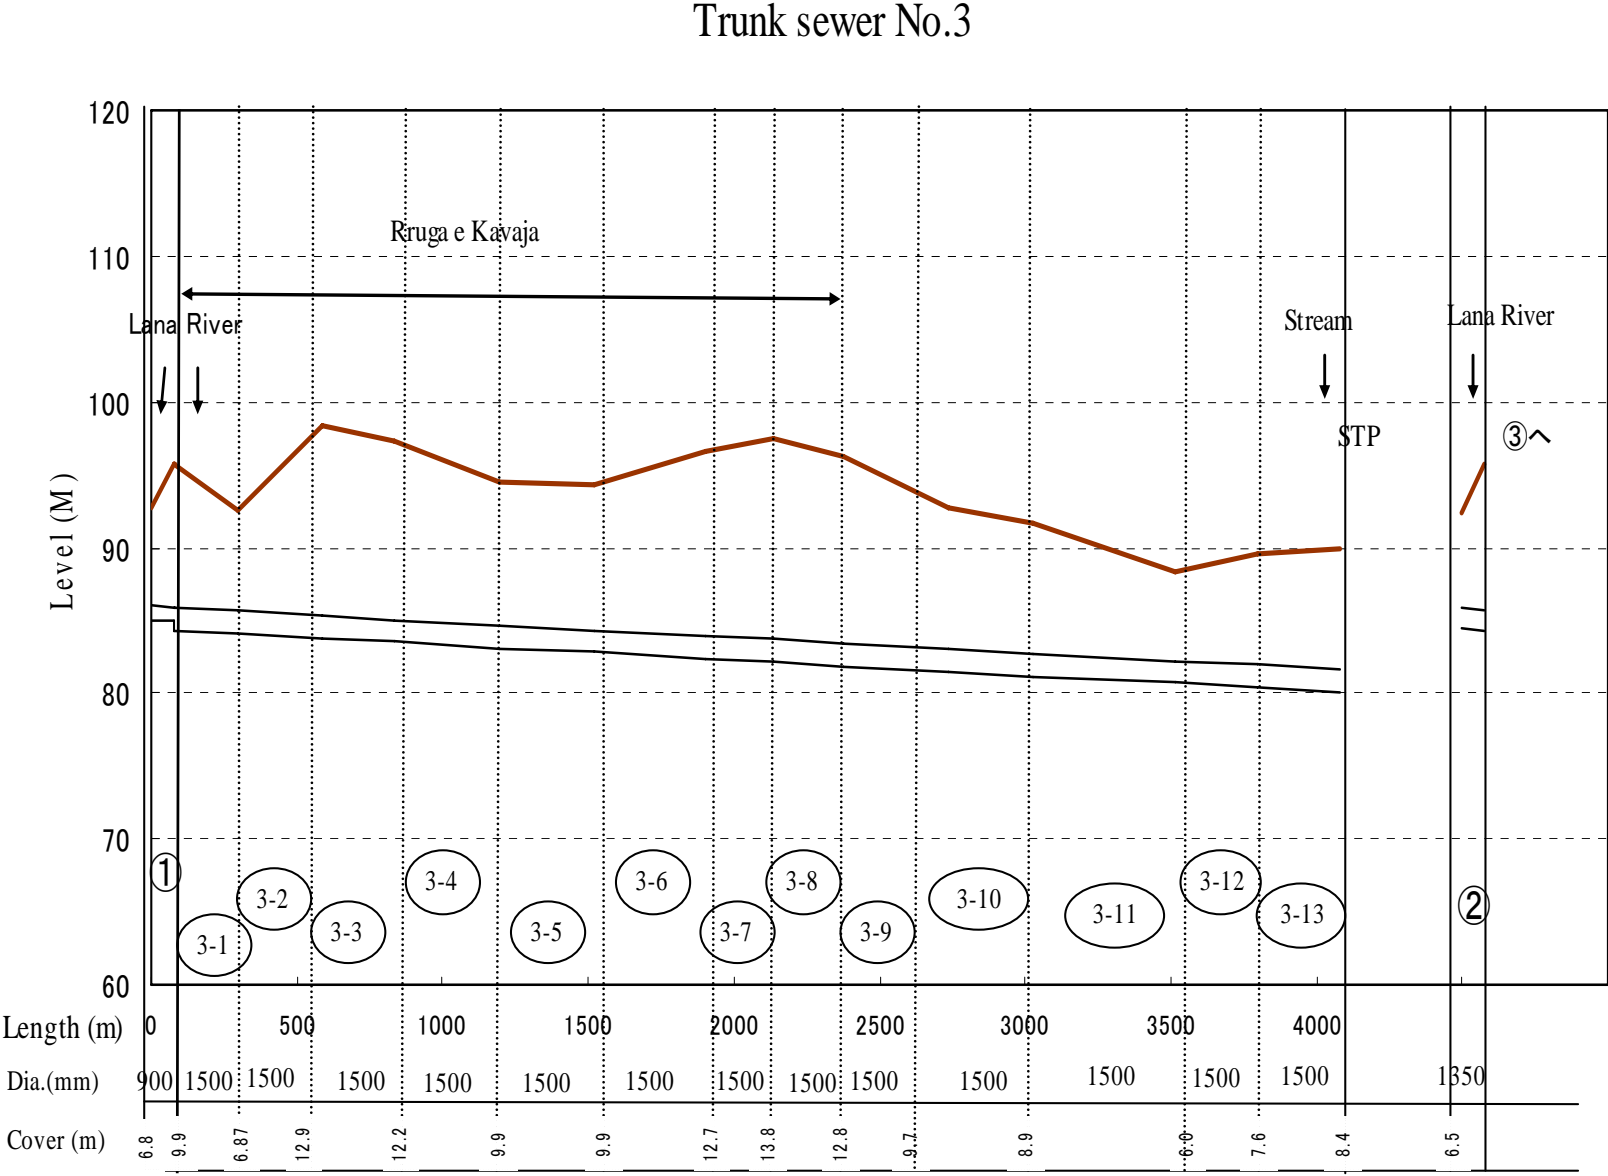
Schematic Profile of the Trunk Sewer No.3
